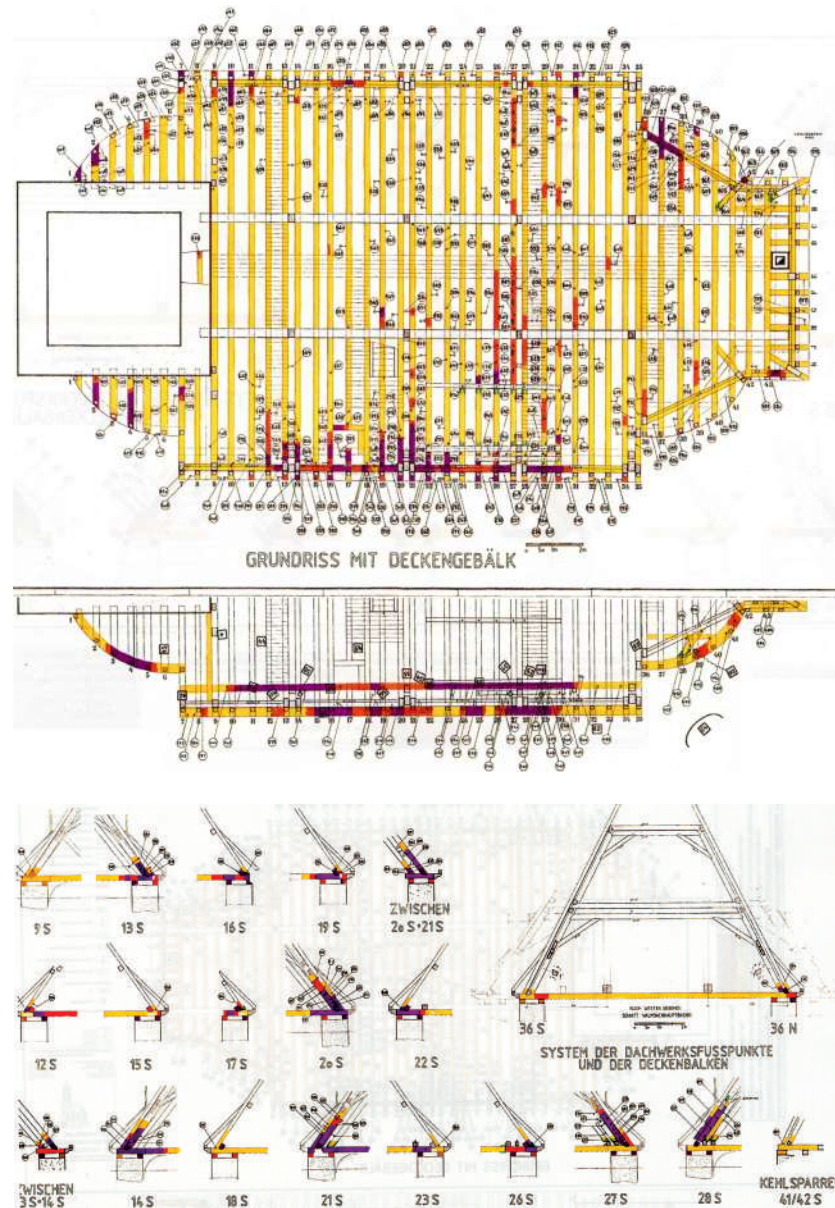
Coloured condition map of the ceiling beam level and uprising construction of a historic church roof truss near Frankfurt, clearly indicating what needs to be done for repairing the structure.
